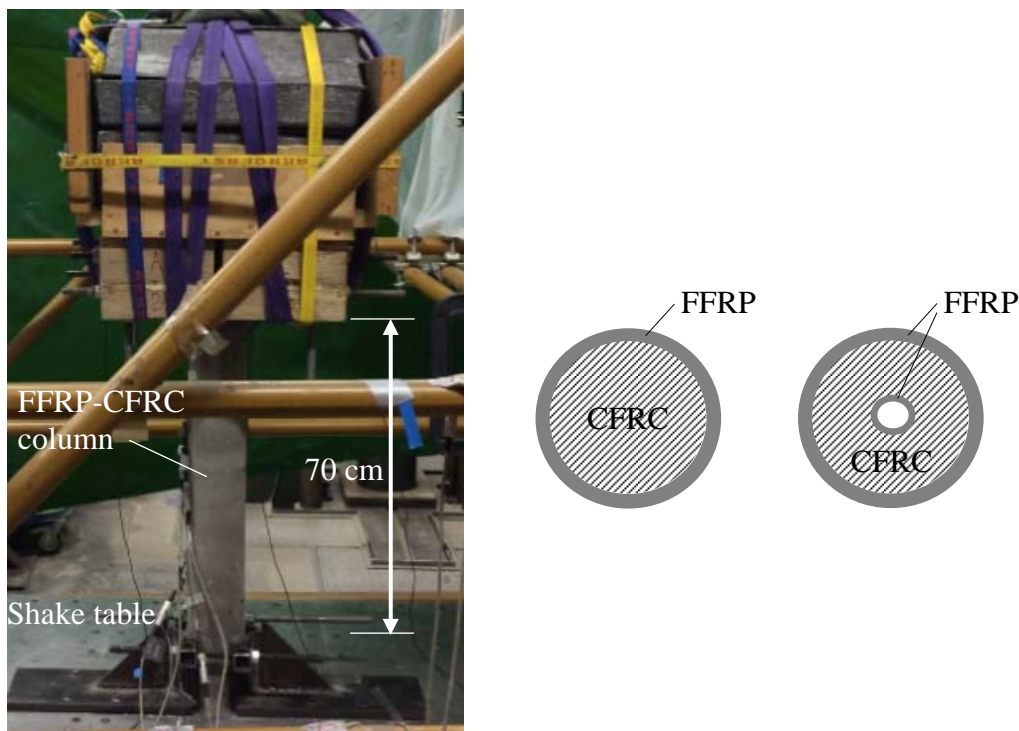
Single and double FFRP tubes confined CFRC composite bridge pier
